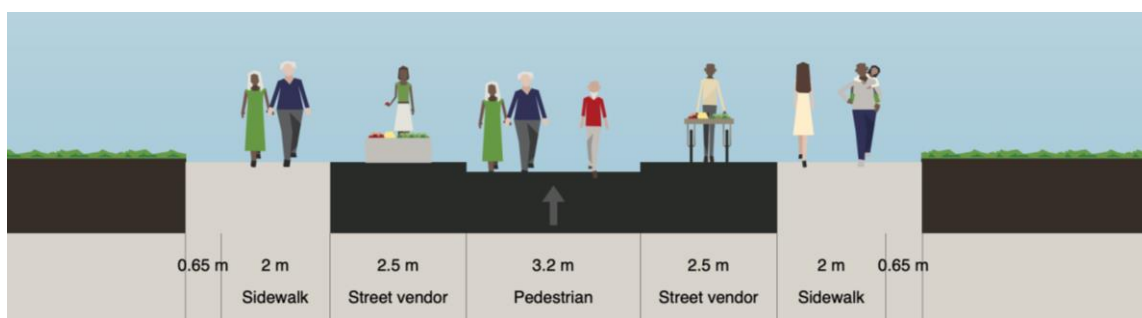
Walthamstow High Street Existing Streetscape (Streetmix, 2024)
